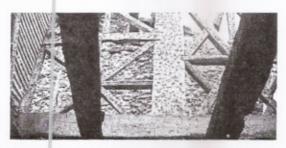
Adobe with timber structure – traditional construction in north of Portugal
